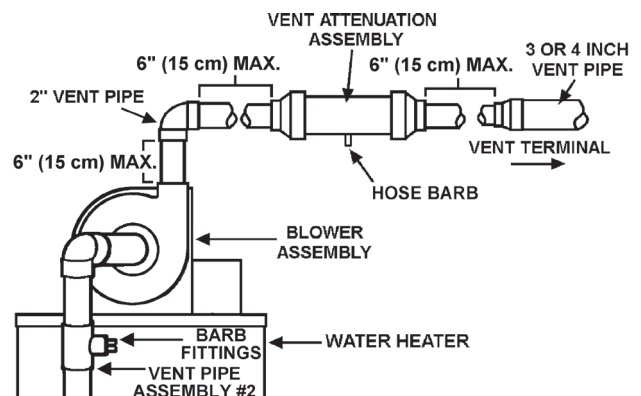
Typical Installation for Horizontal Vent with 3 or 4 inch Pipe
